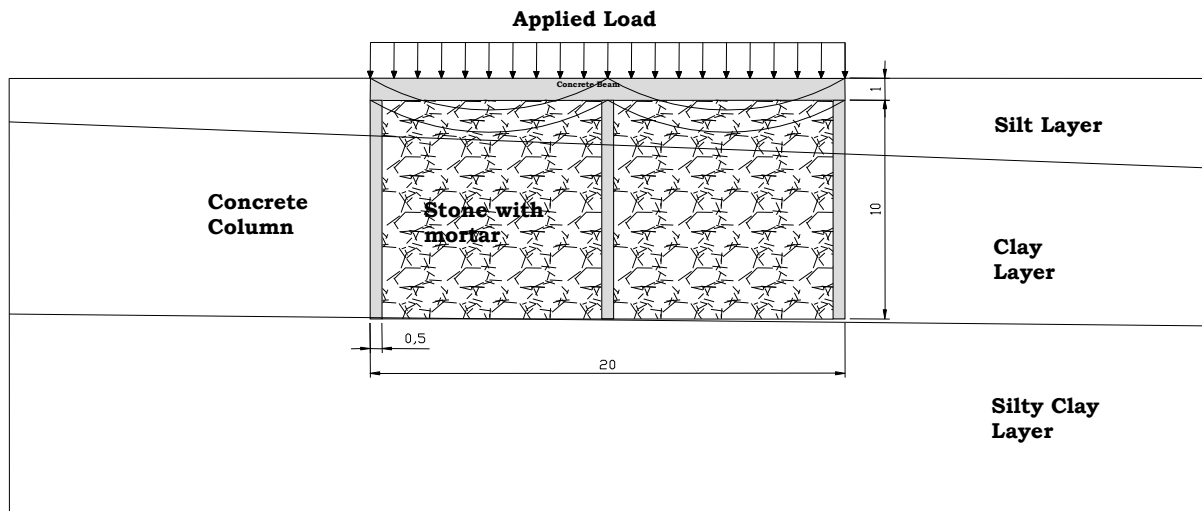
The deflection happened in the rock foundation consisting of pieces of rocks, reinforced concrete beam and columns
